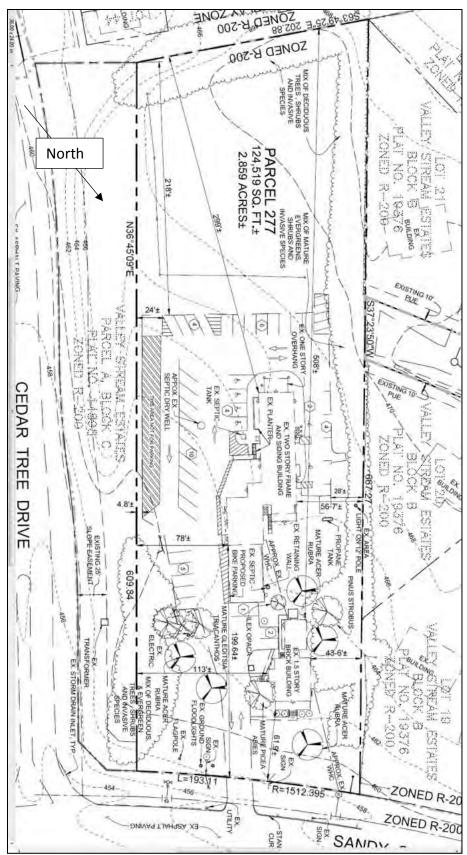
Proposed site plan with existing buildings, parking, and landscape.
